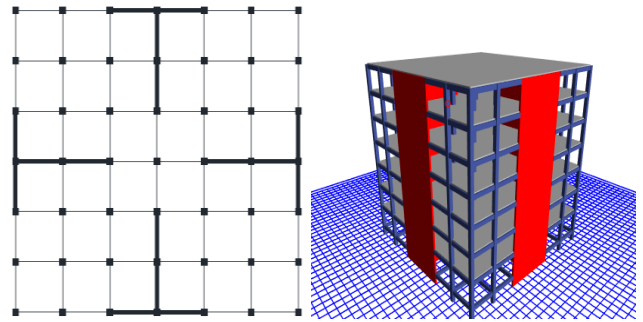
Building with T-shape shear walls on plain and sloping ground
